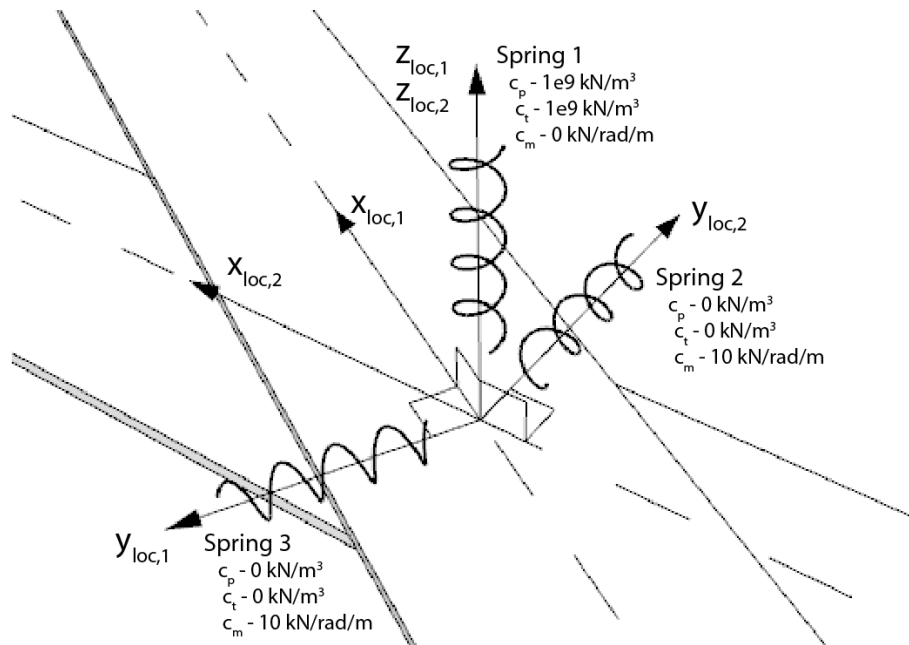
Direction and stiffness of springs in coupling joint between laths
